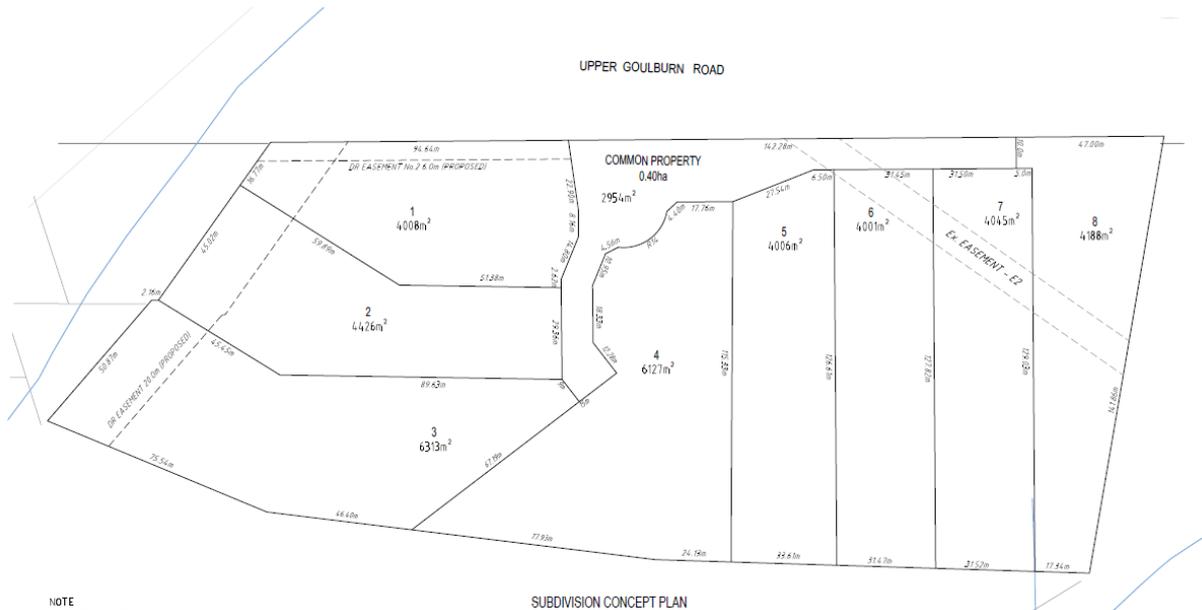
Subdivision Concept plan of the proposal (Source - PGA, 2021)
